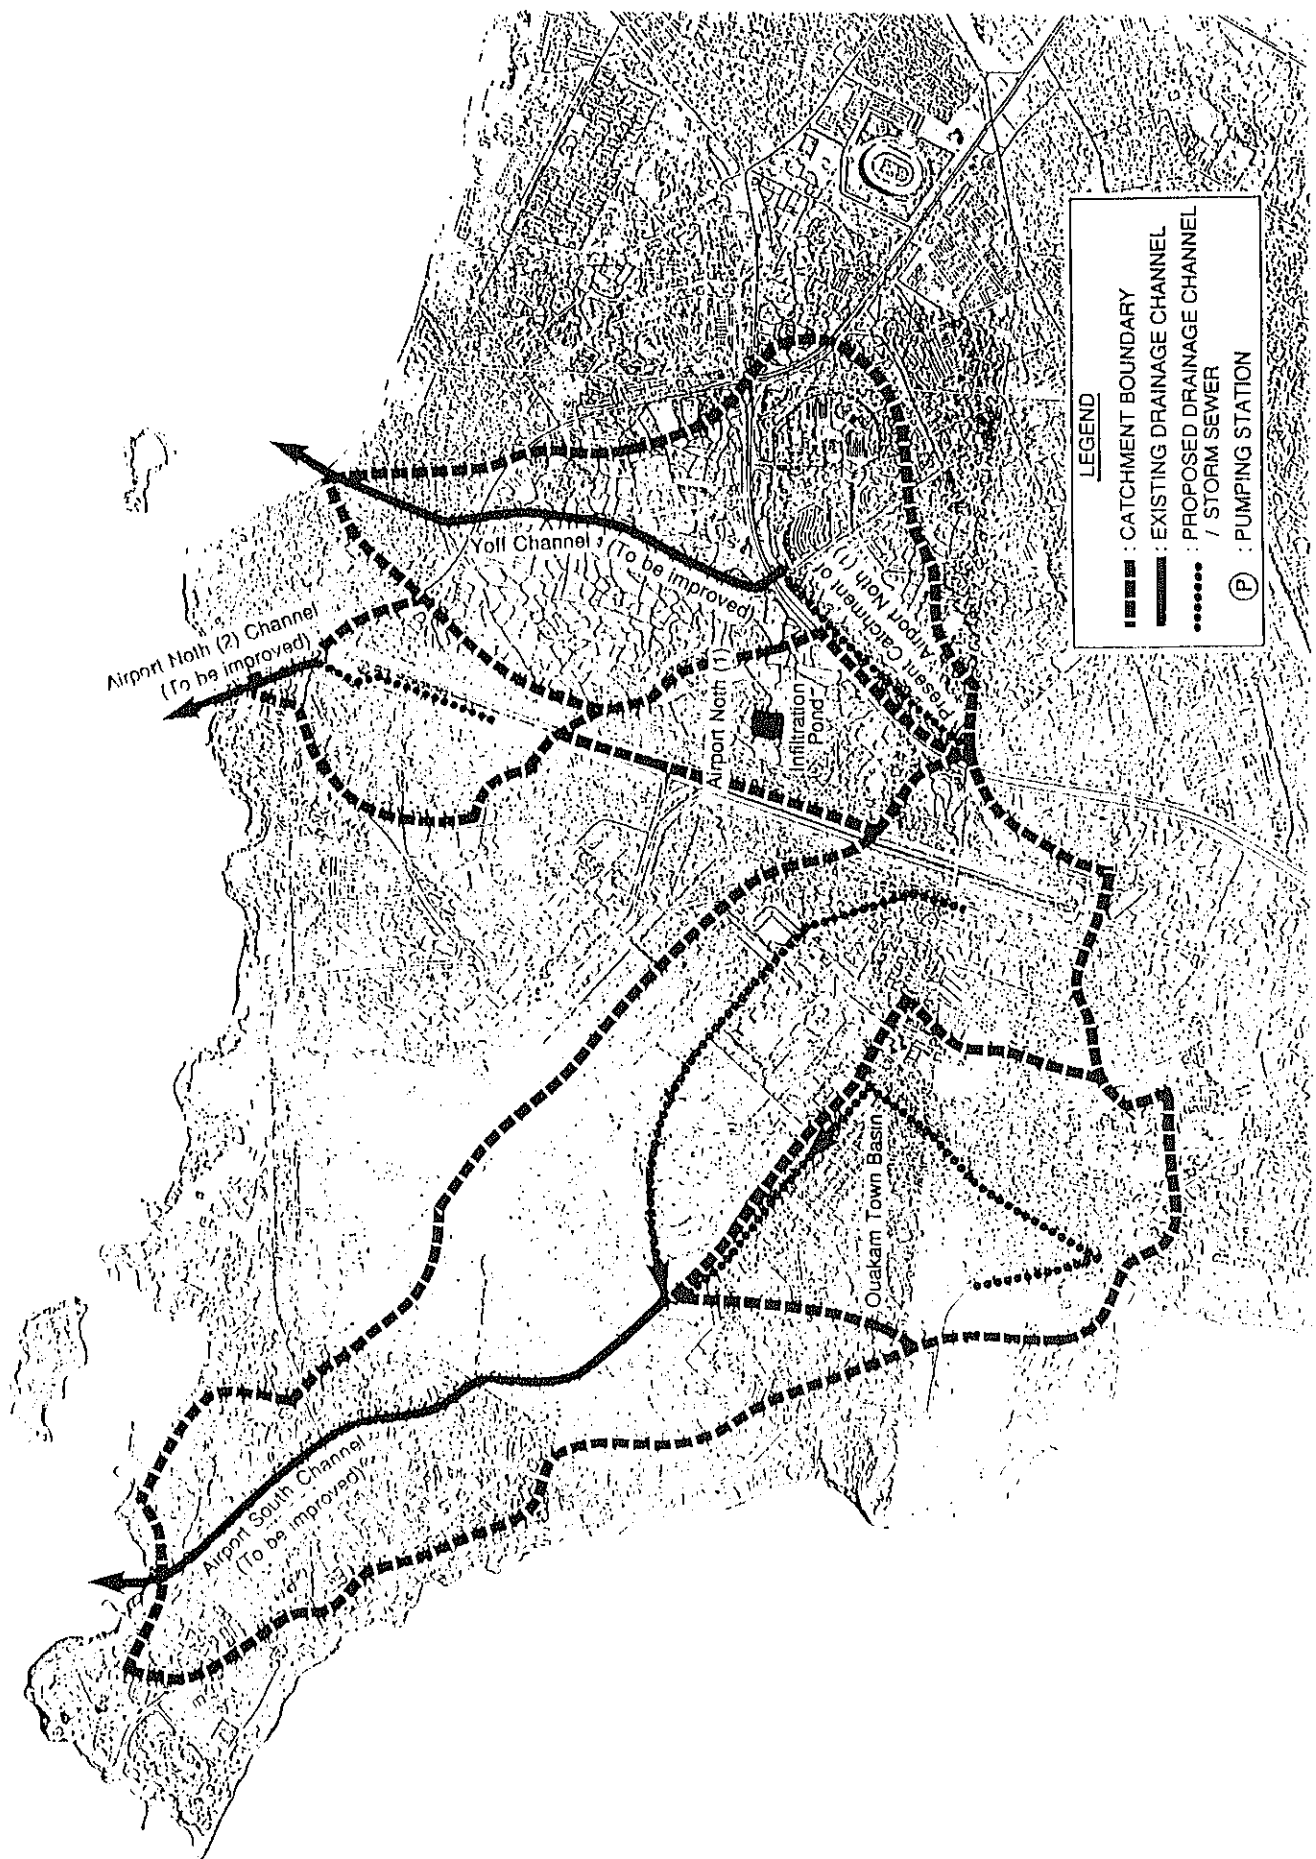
PROPOSED DRAINAGE IMPROVEMENT PLAN
